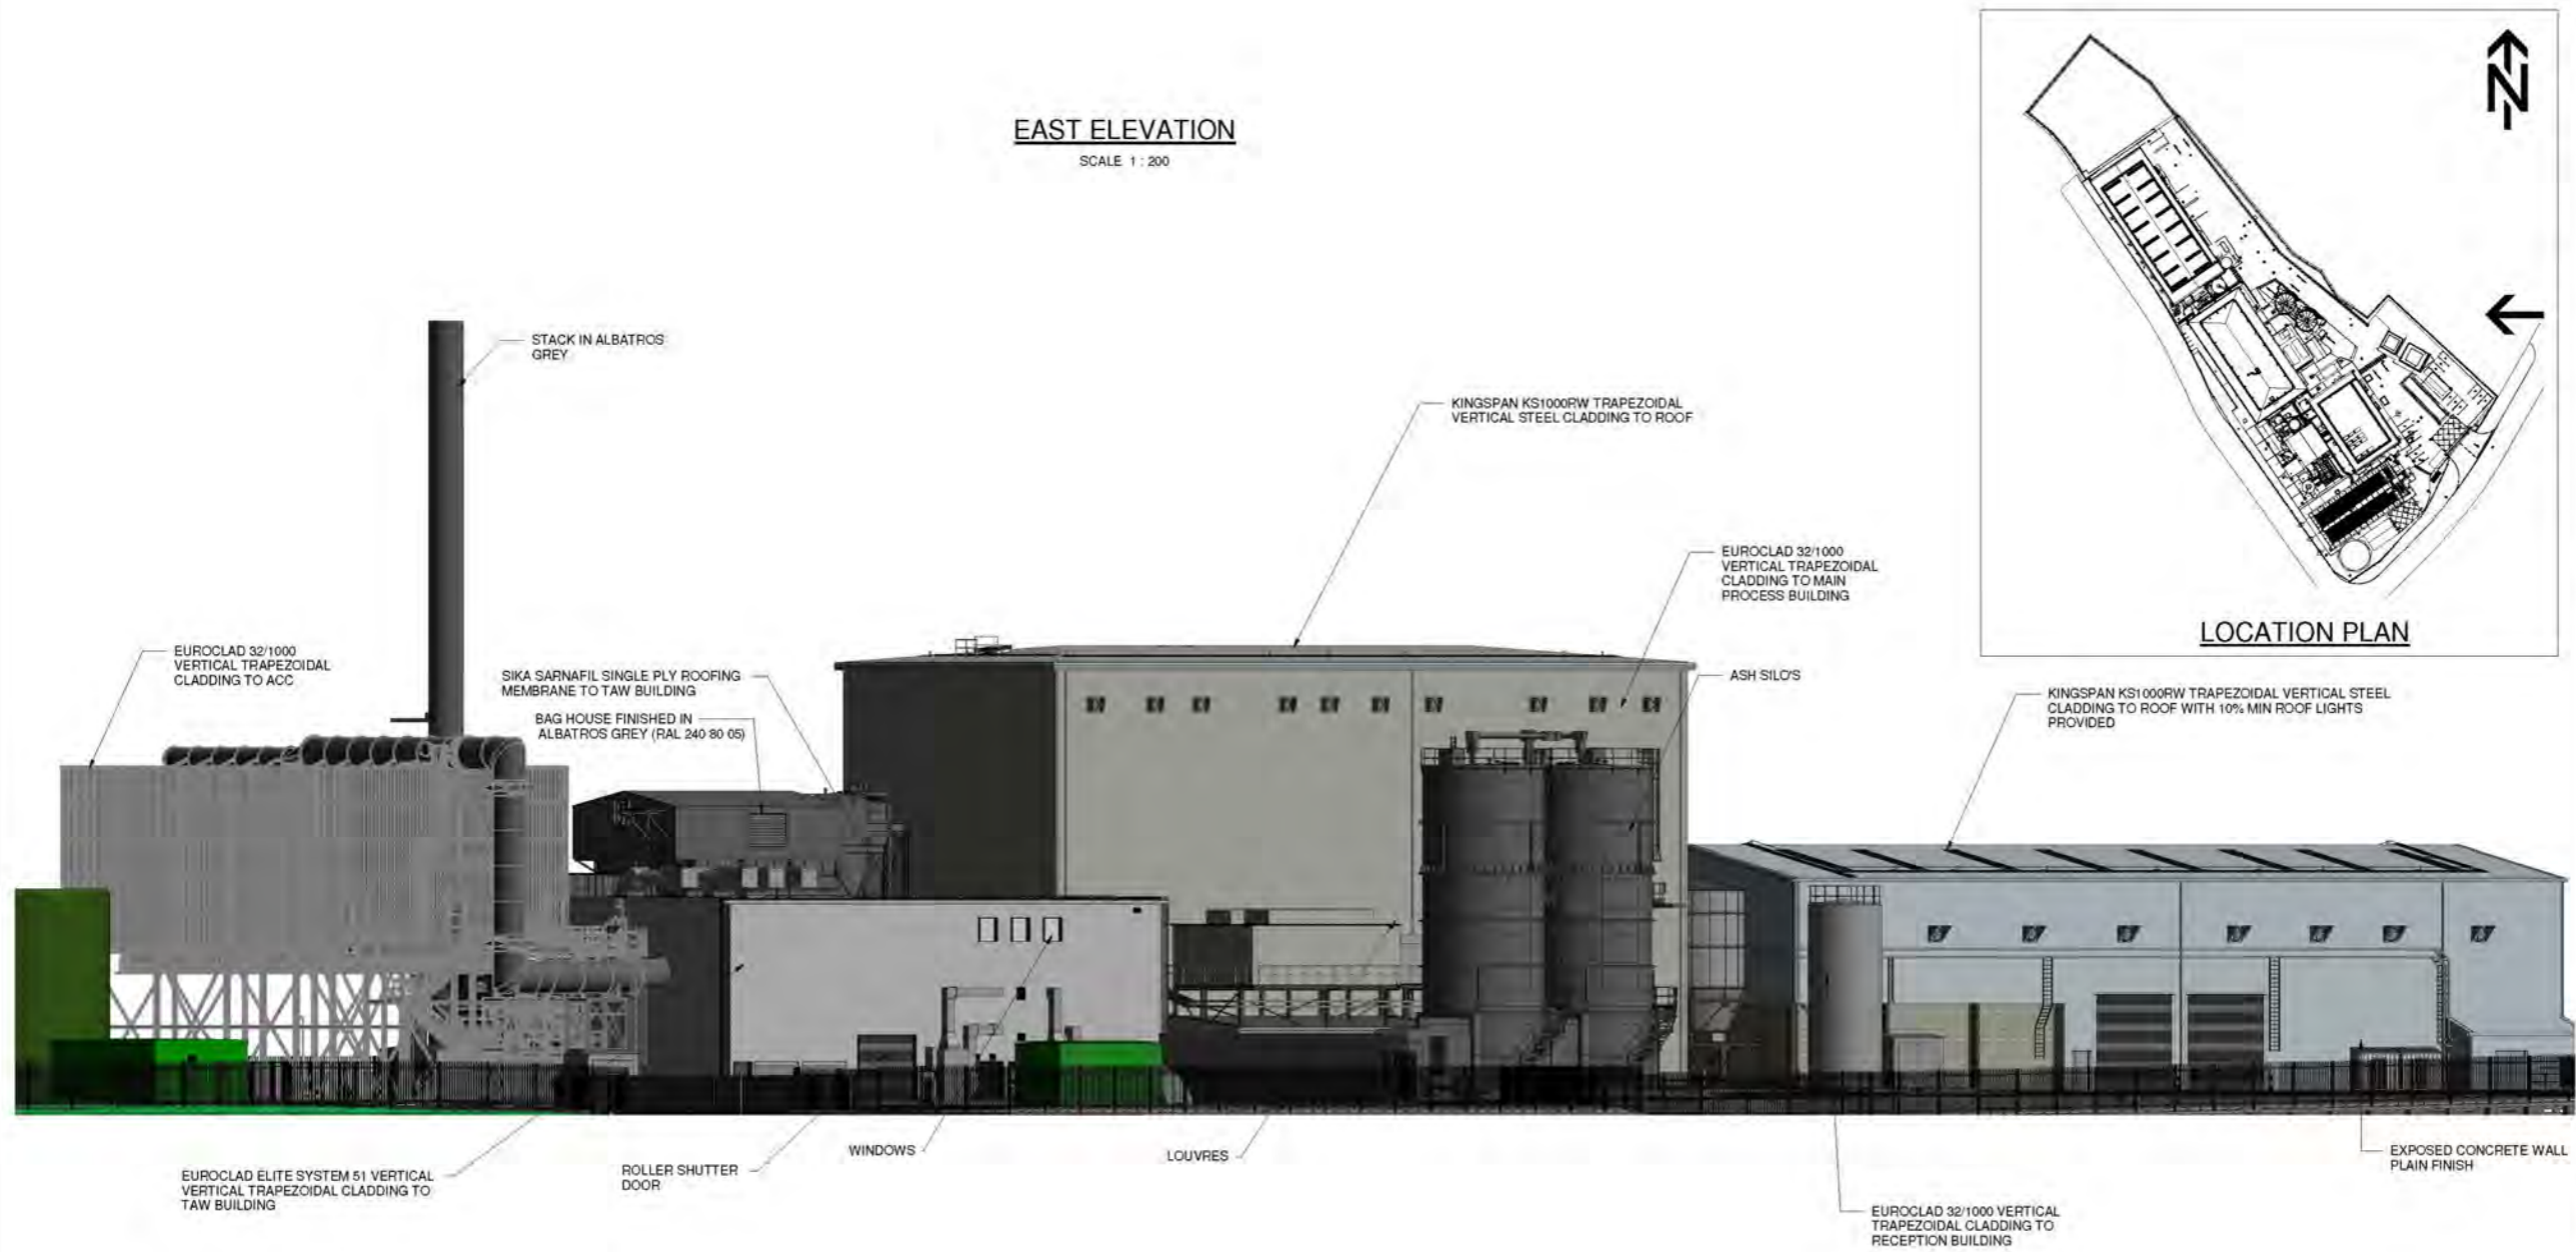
East Elevation—BARRY\_19\_DWG\_01\_40004
